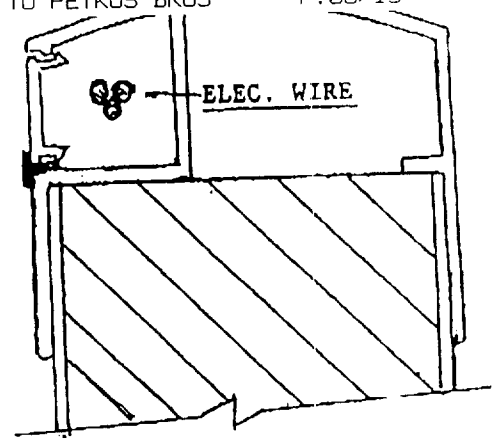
ELECTRICAL LOAD BEARING BEAM
